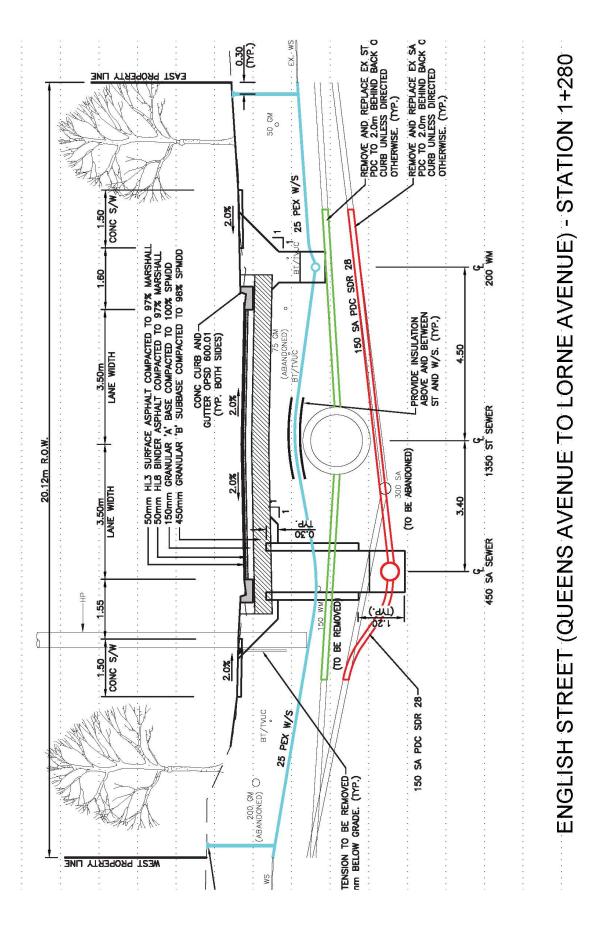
Cross-section of English Street Infrastructure Renewal Project for English Street between Queens Avenue and Lorne Avenue.
